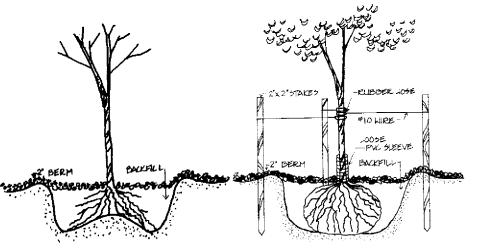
(far left) bare root planting detail. Balled and burlap tree planting detail (right).
